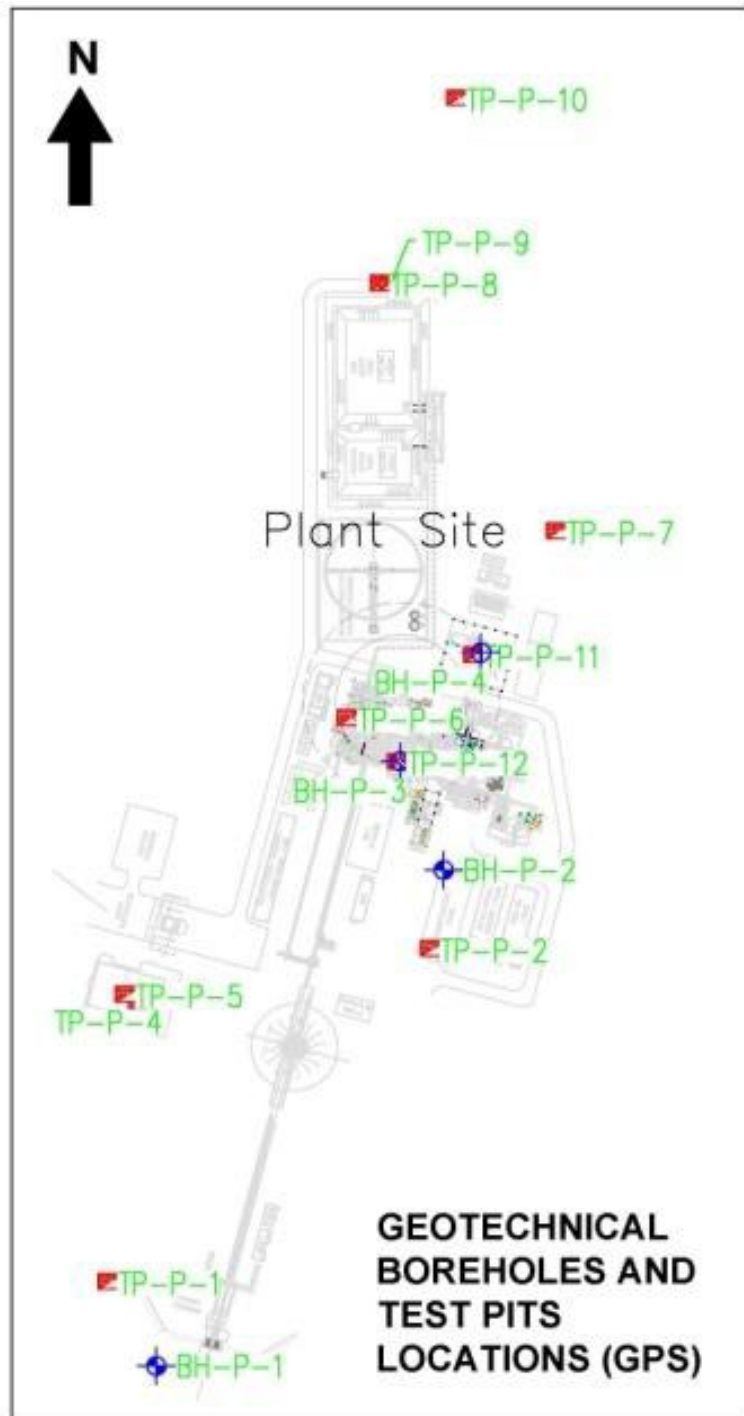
Plant Area - Geotechnical Boreholes and Test Pit Locations
